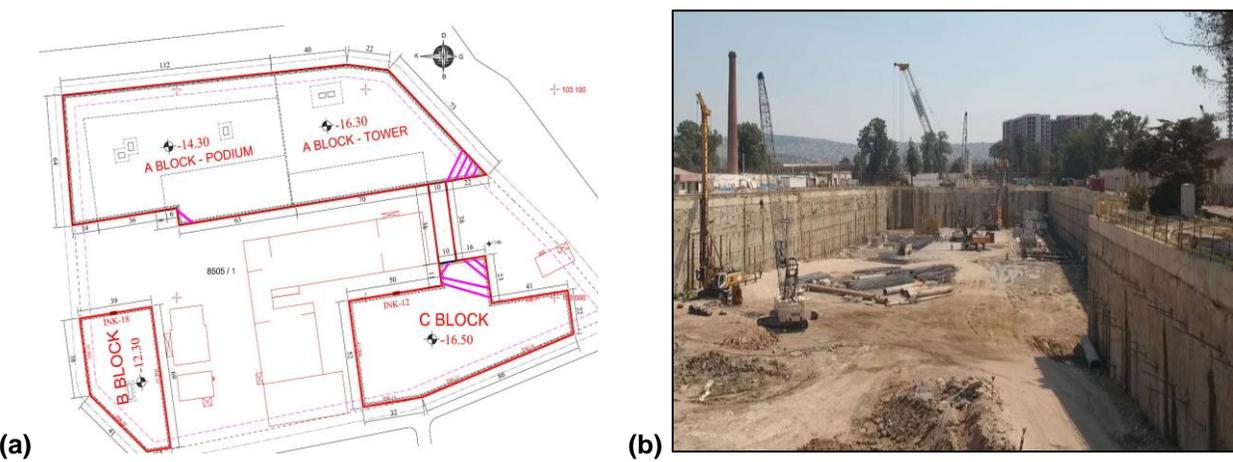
Mahall Bomonti project (Izmir, Turkey): (a) plan view of the three construction blocks and (b) photograph of SBMA anchored diaphragm wall in Block A
